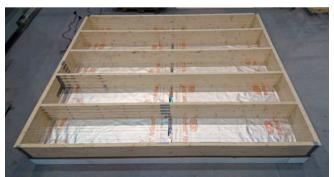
Photo showing the timber frame test section under construction with a reflective foil at the hot side of the cavities and thermocouples mounted for measuring temperatures inside the cavities. Edge insulation partly mounted, (right).
